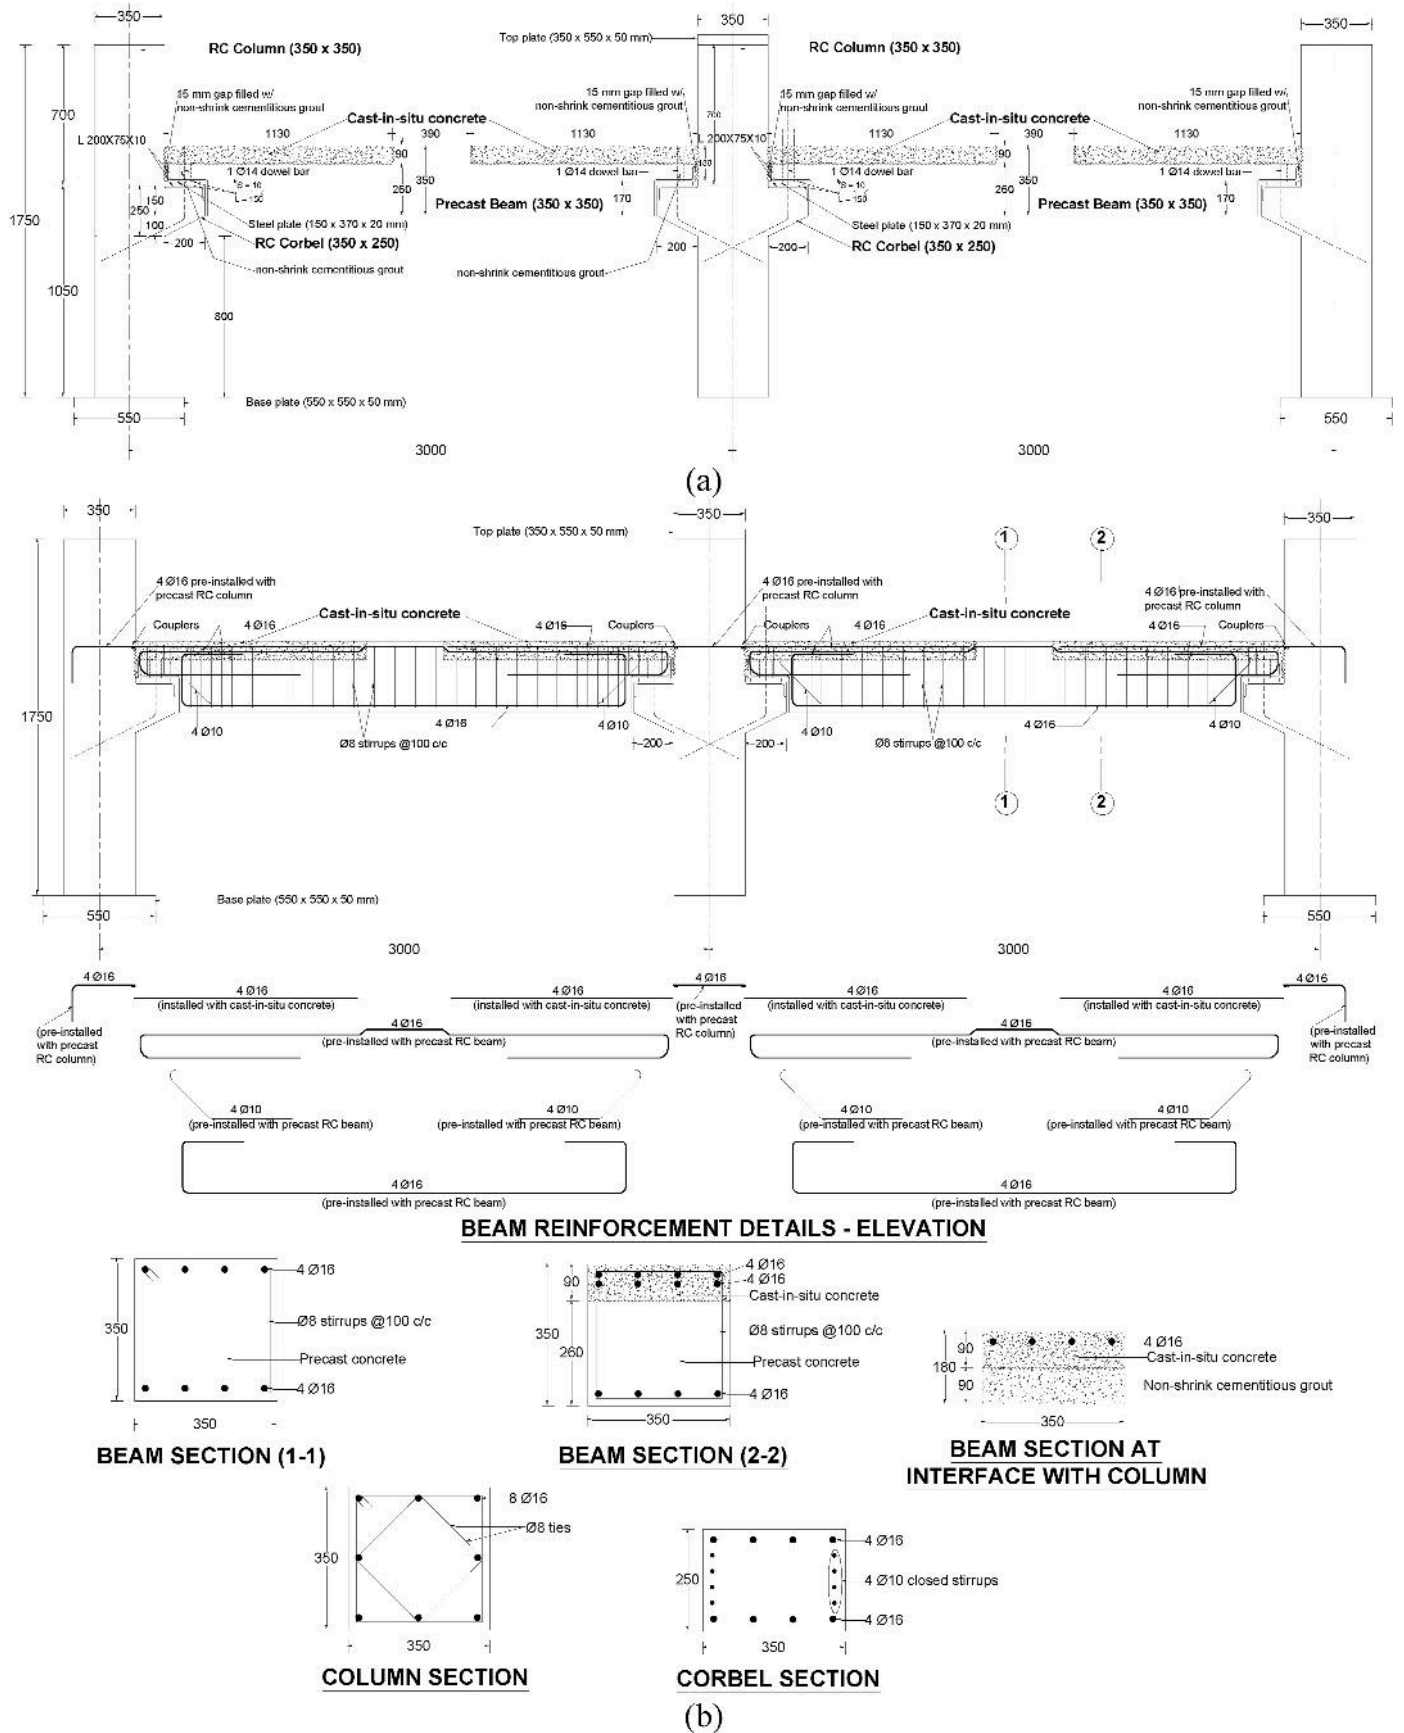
Details of precast assembly P-MC-T2-ANG with type 2 moment connection (Dimensions are measured in mm): (a) Concrete dimensions; (b) Reinforcement.
